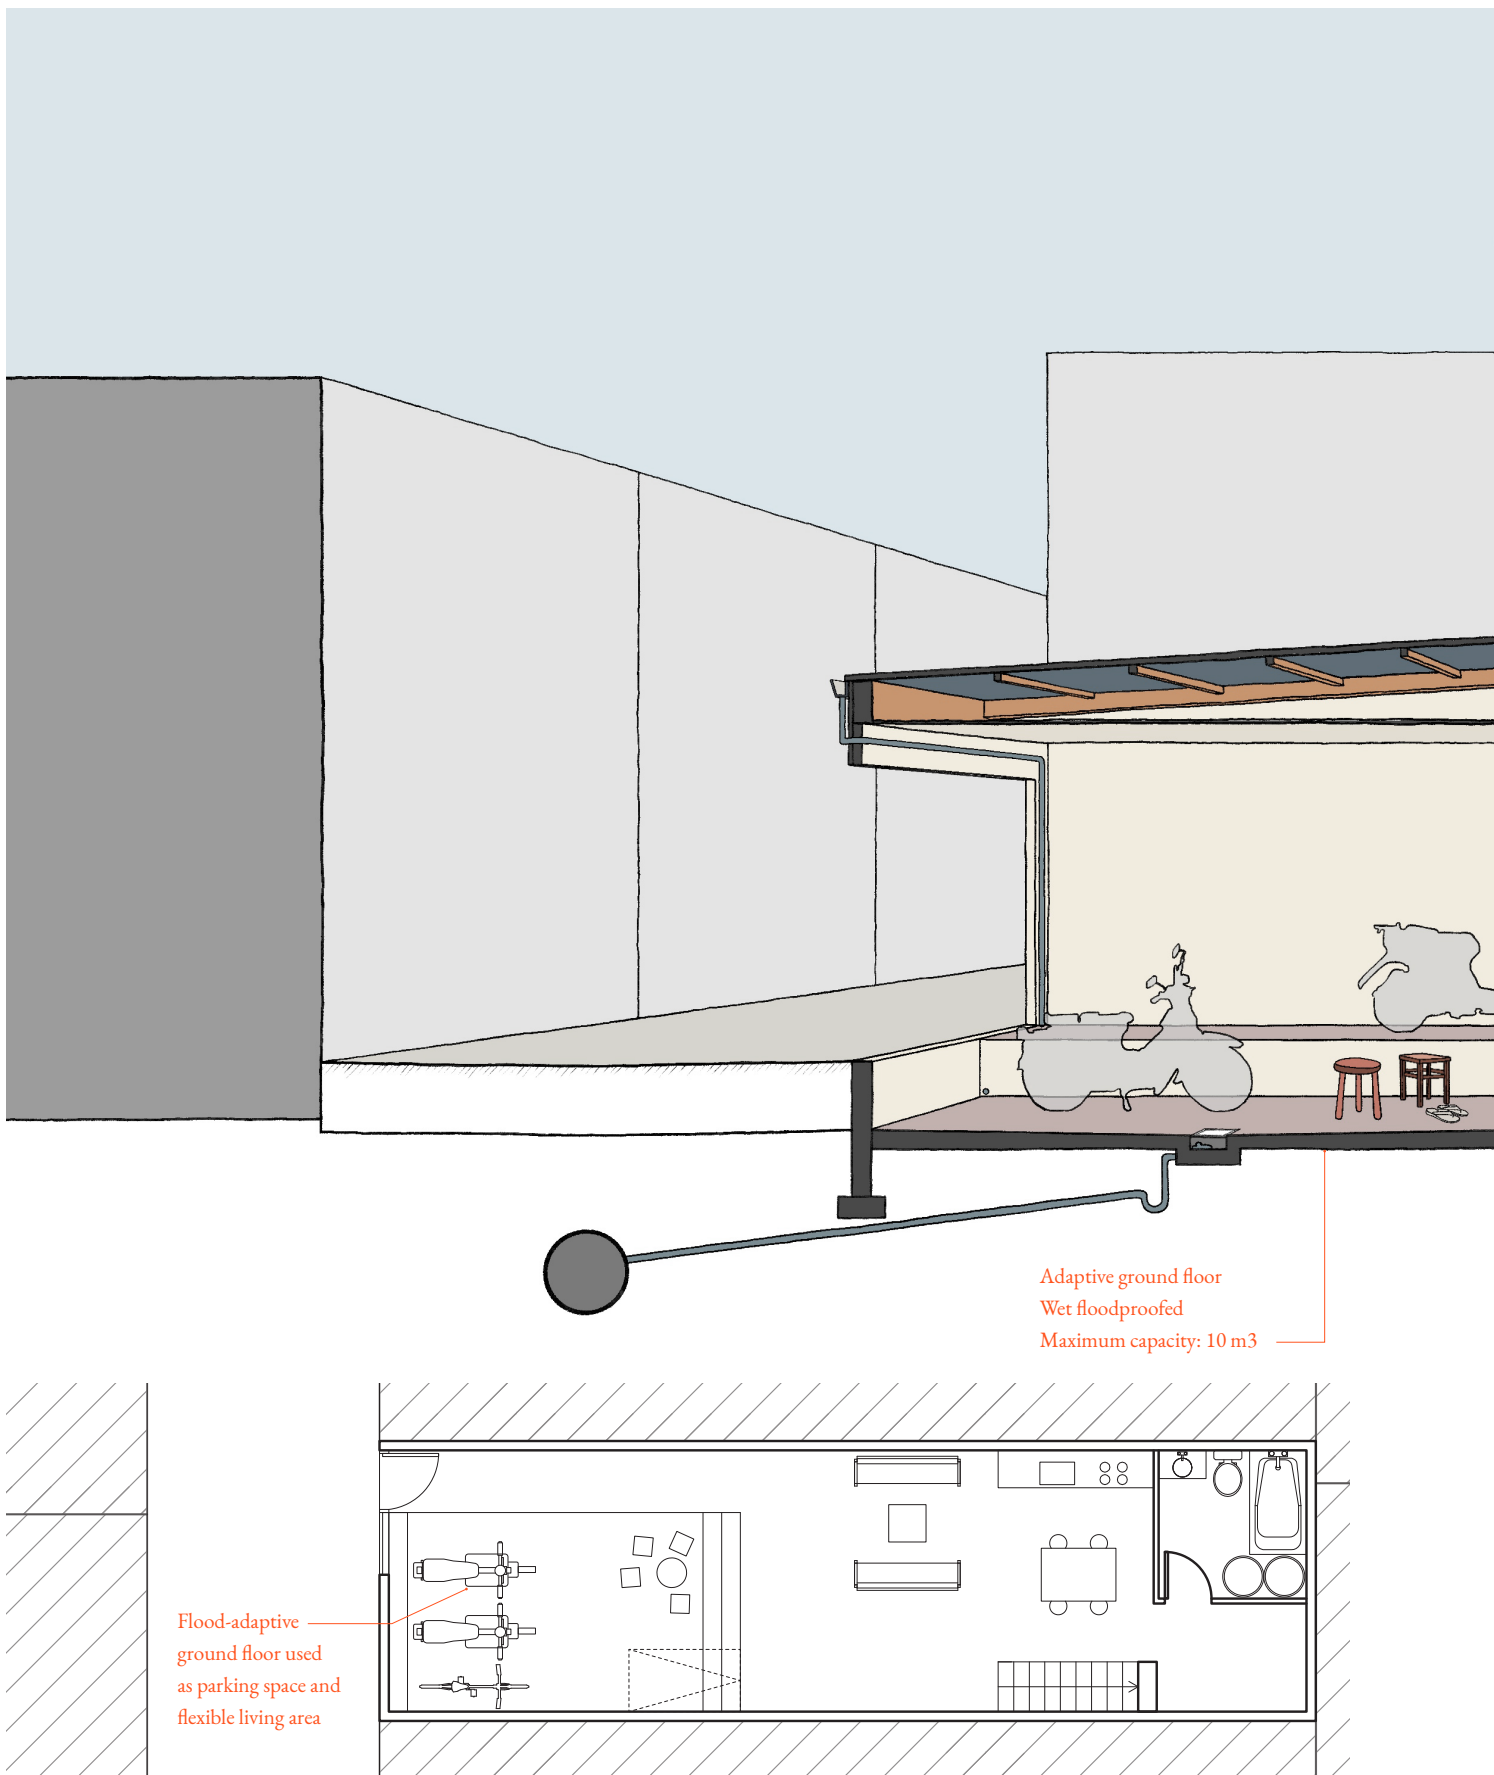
Plan of retrofitted alleyway house without front yard in dry condition.
